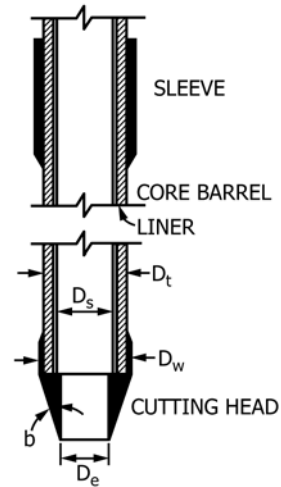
Critical Dimensions for Cutting Bits and Core Barrels (11)
